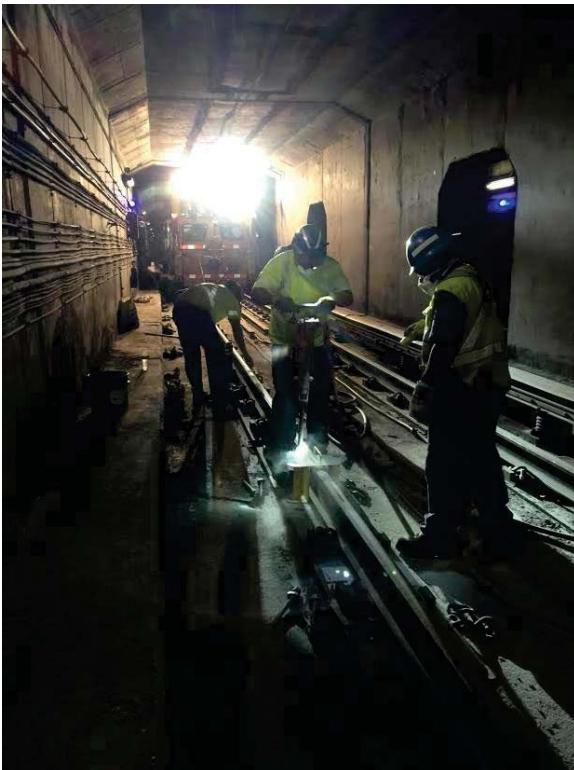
Rock Drilling and Anchor Bolt Replacement
